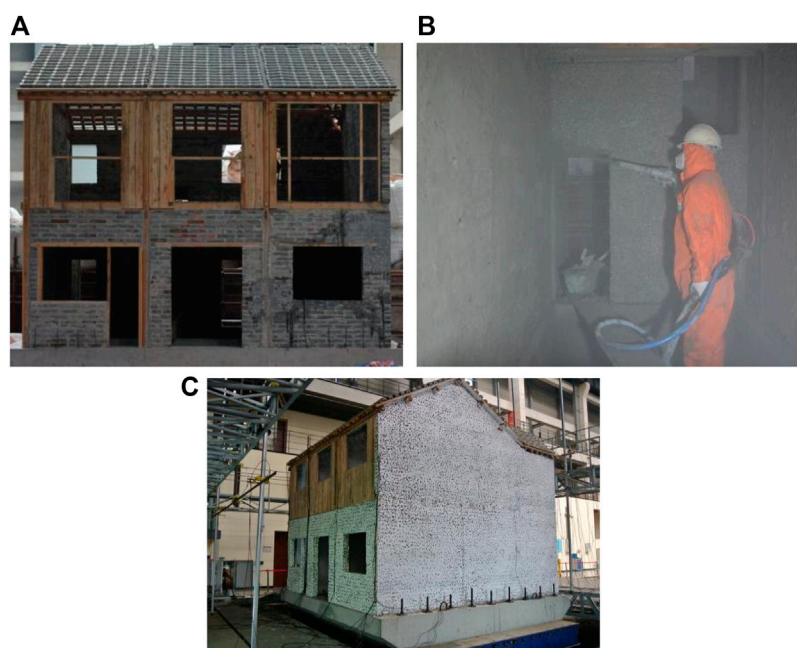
Chuan-dou timber-framed masonry building: (A) Earthquake damaged building, (B) Process of spraying UHDC layer and (C) Shaking table test of the strengthened masonry building.
